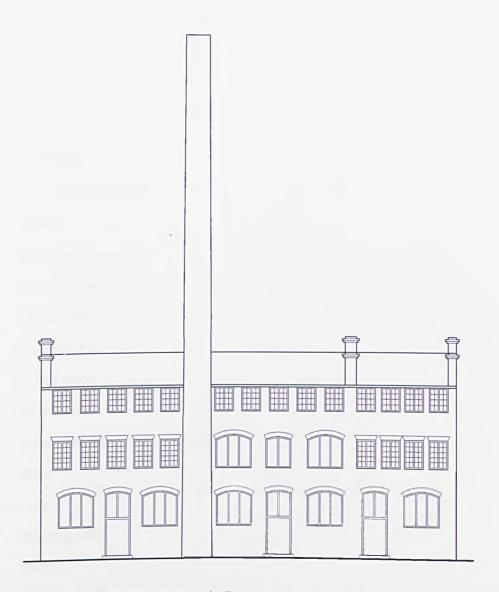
Gaunt's Cambridge Street grinding wheel and cutlers' shops, south elevation to yard. Scale 1:200 (author).
